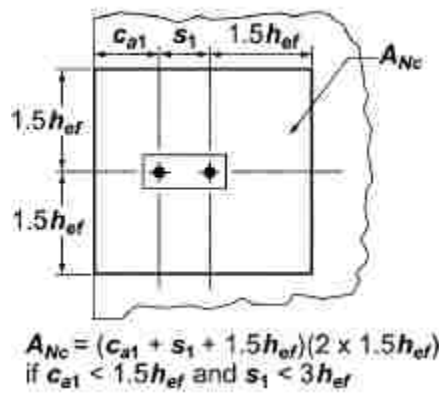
Projected concrete failure area of a group of anchors (ACI 2011)
